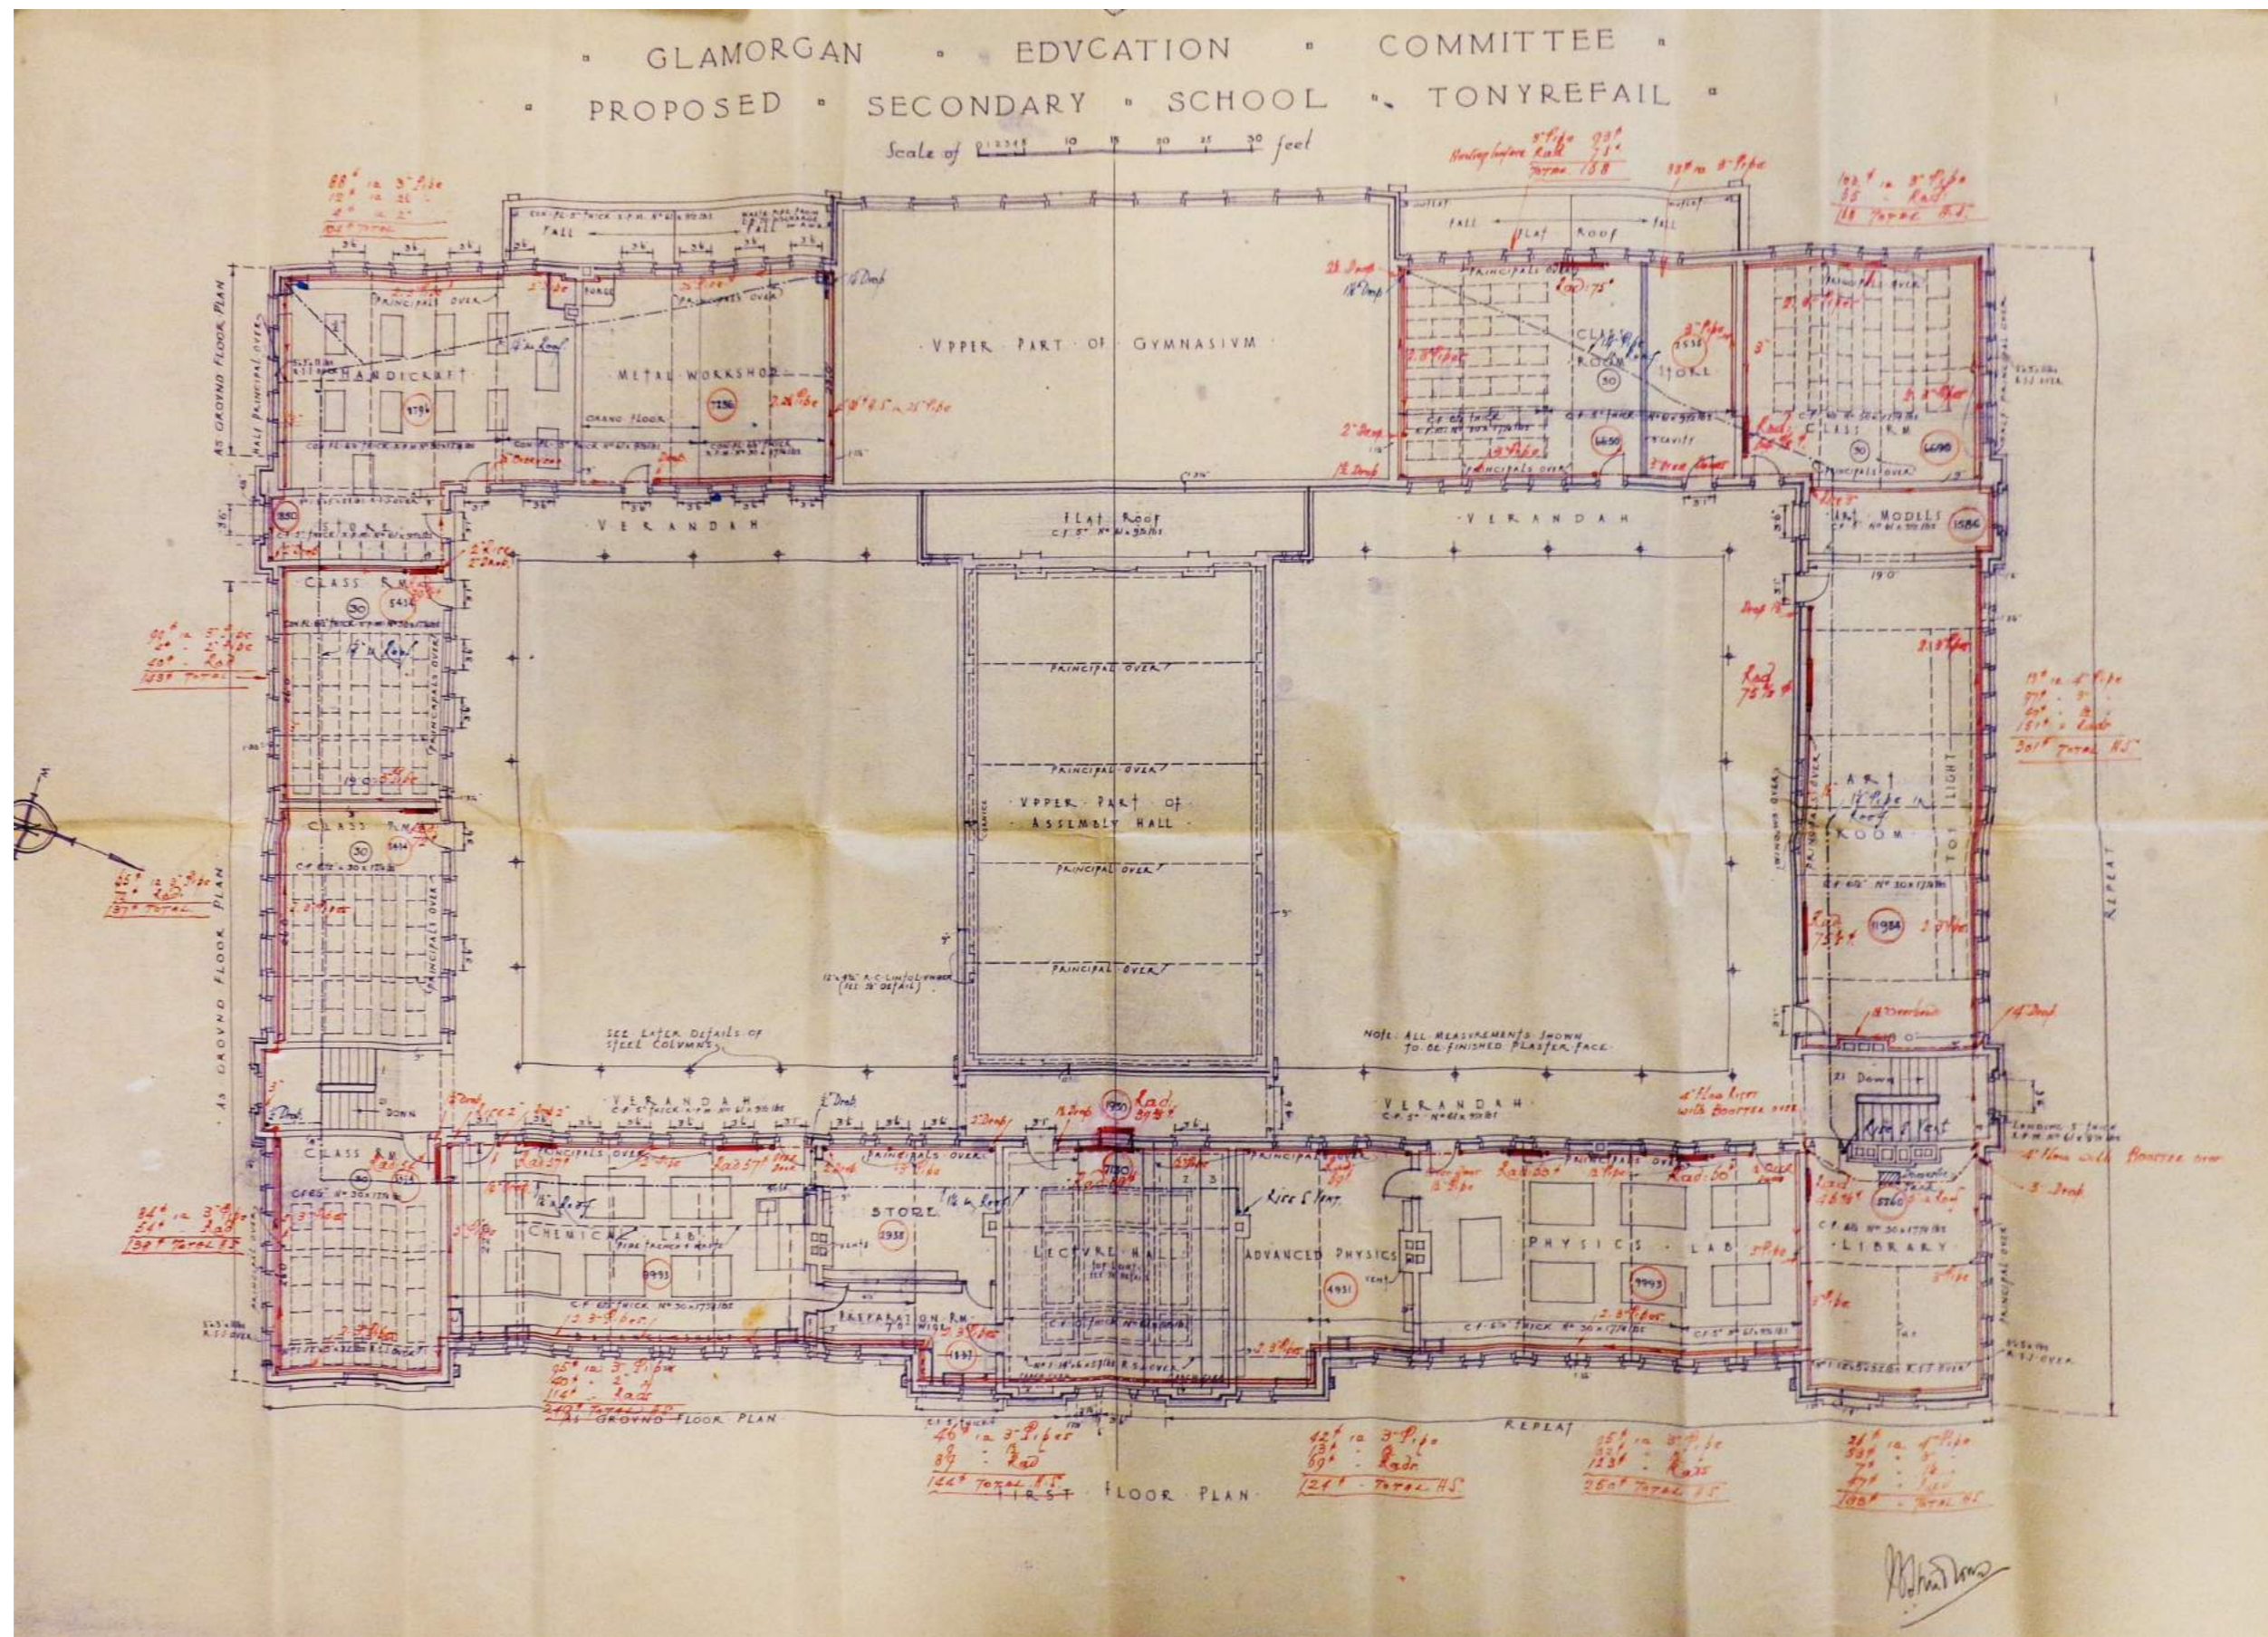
Original plan from 1932 of Tonyrefail Secondary School First Floor, for installation of hot water heating.
